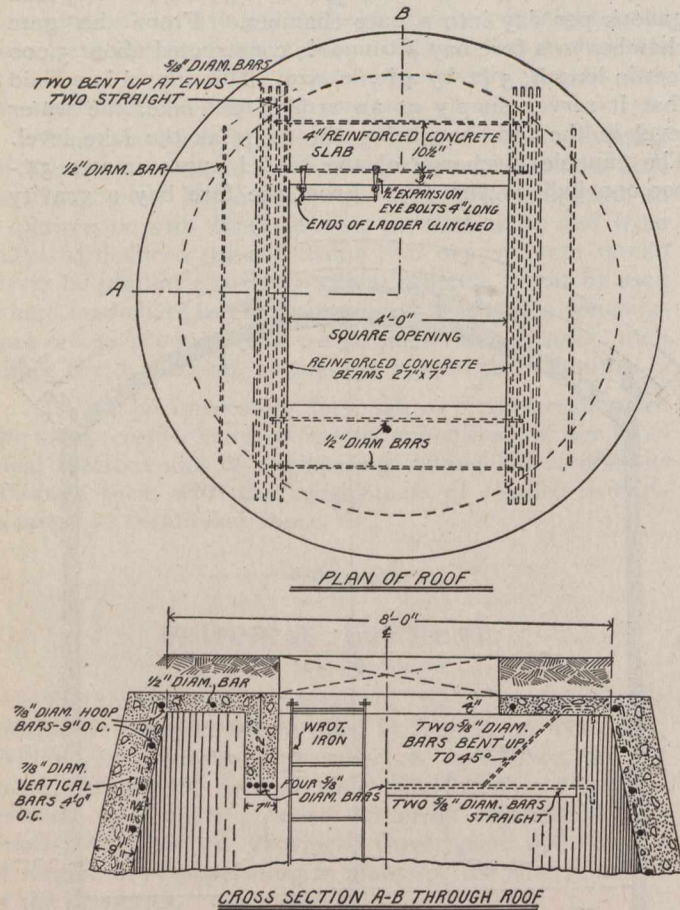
Details of Shaft on Each End of River Tunnel.
